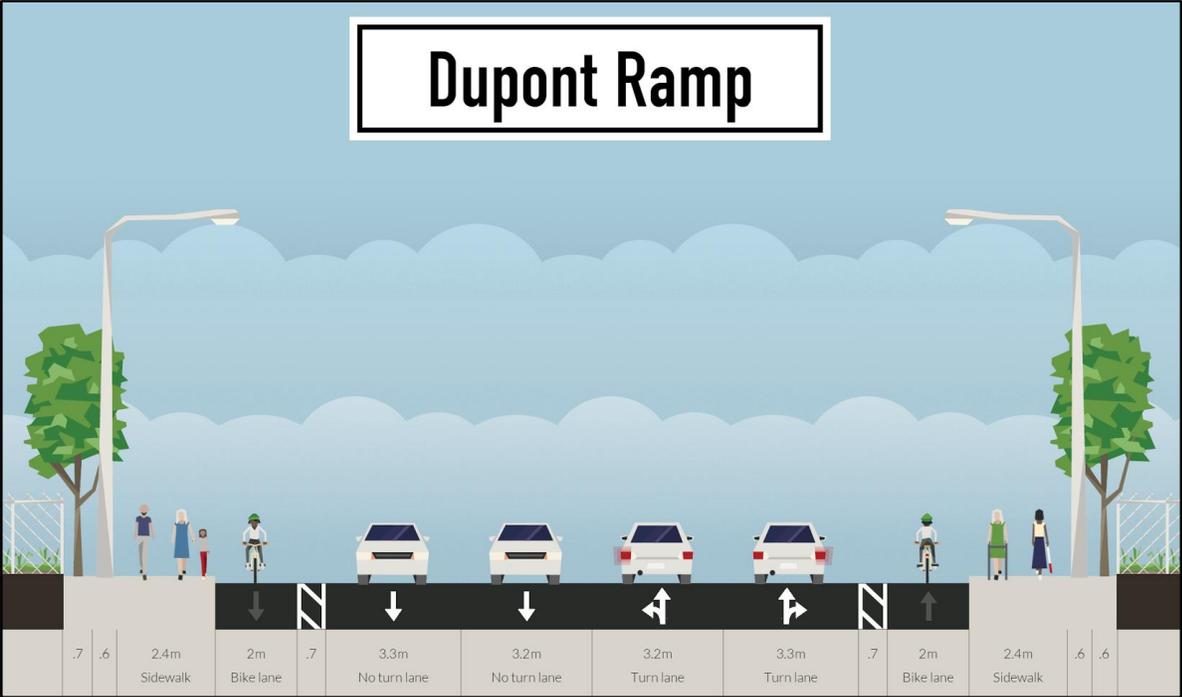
Cross-section of the new island ramp (Figure 4(2)).
